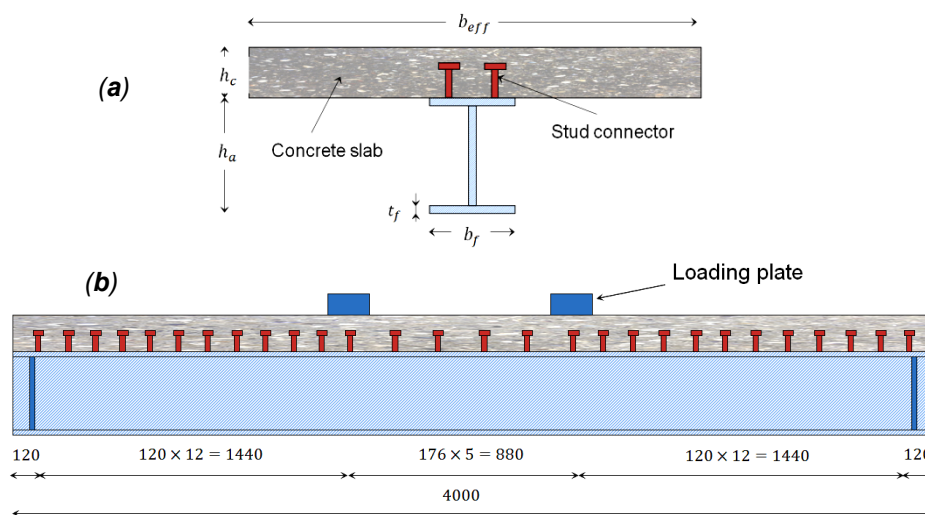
Cross-sectional dimensions of composite beams: (a) cross-section; (b) longitudinal section
